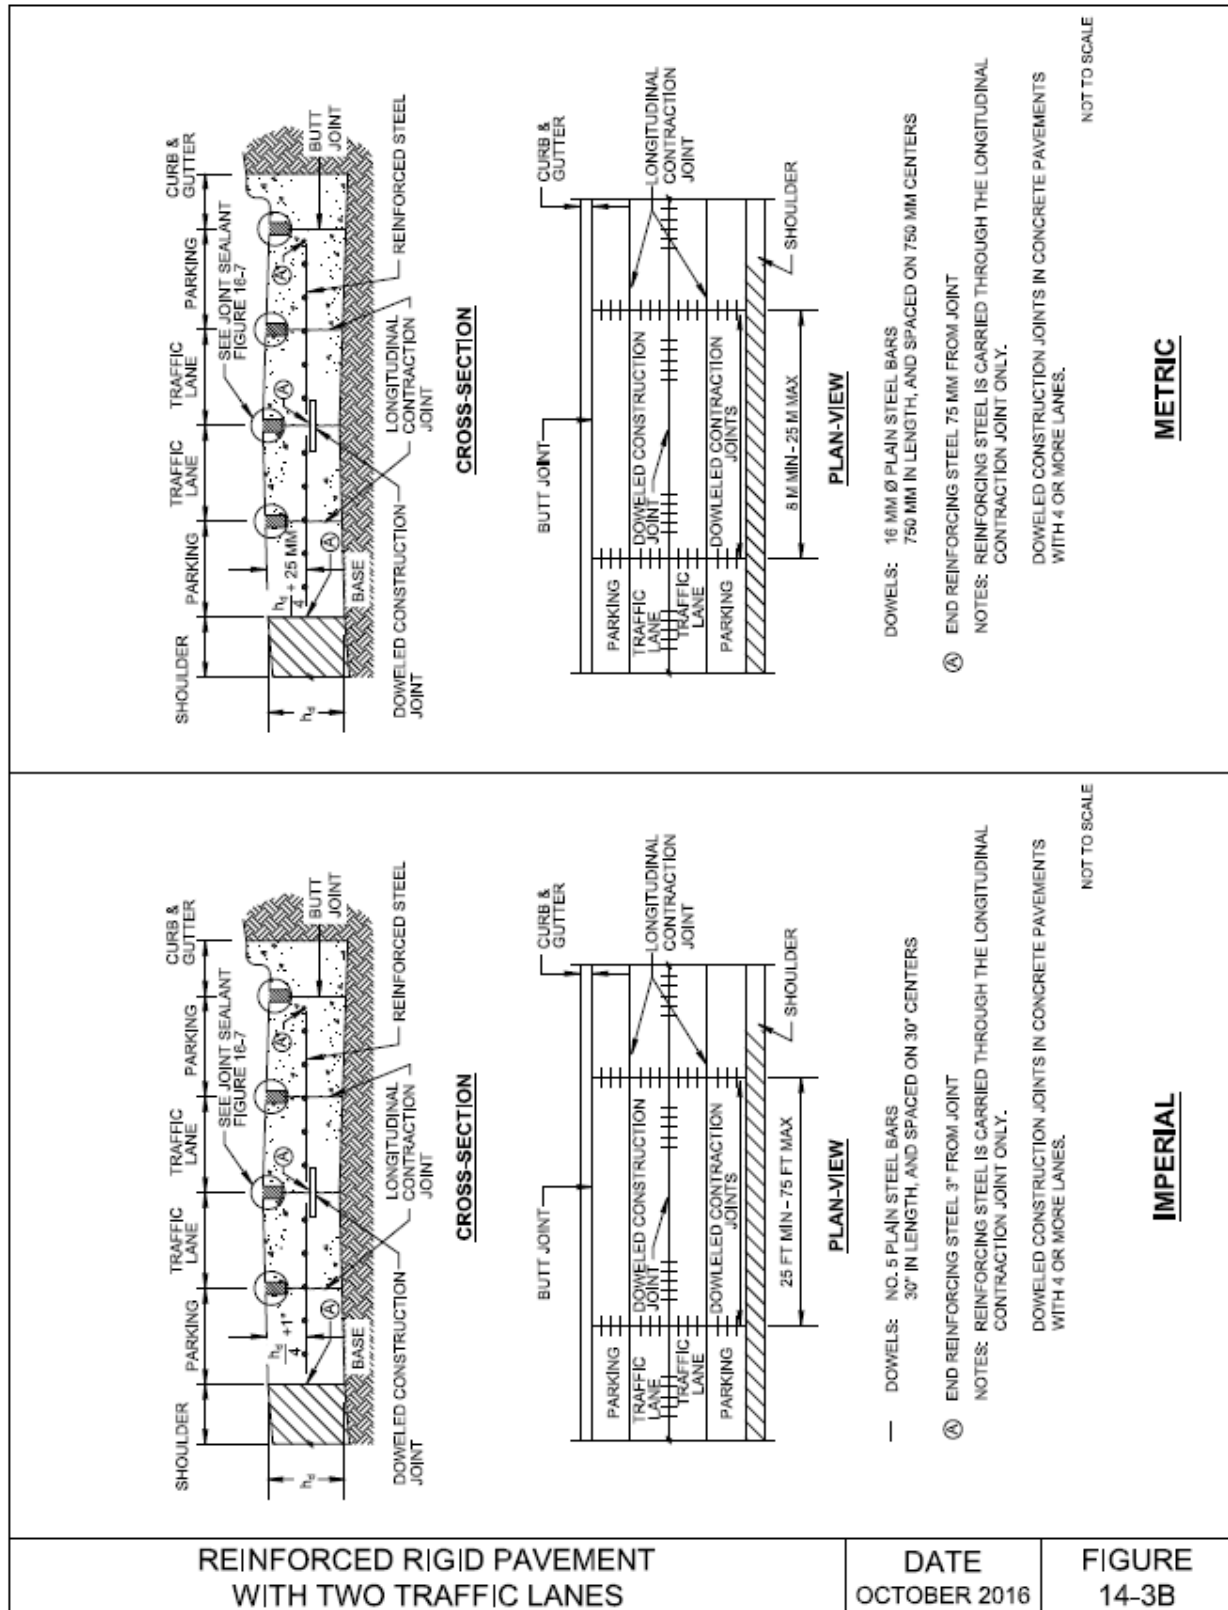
Reinforced Rigid Pavement with Traffic and Parking Lanes
